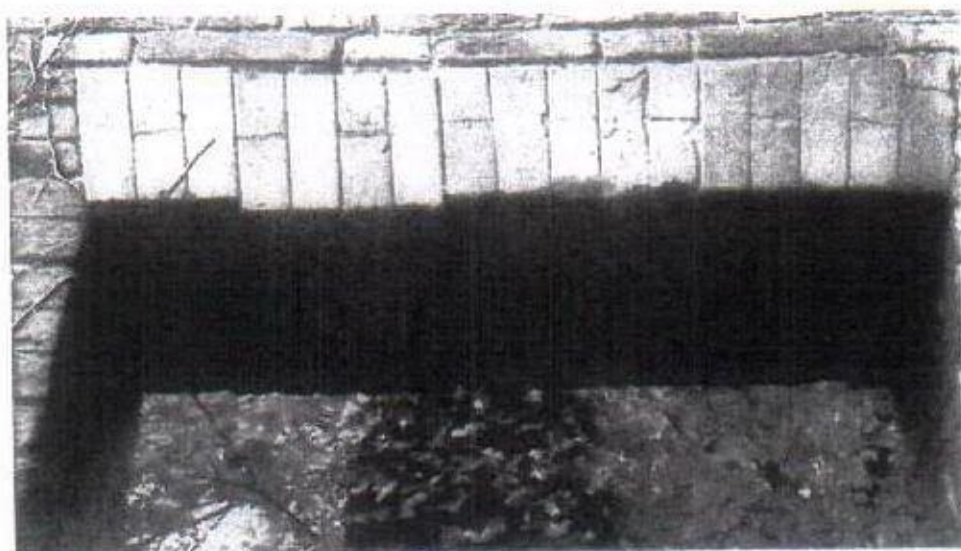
ITALIAN TERRACE GARDEN BOTTOM HEAD WALL 25
